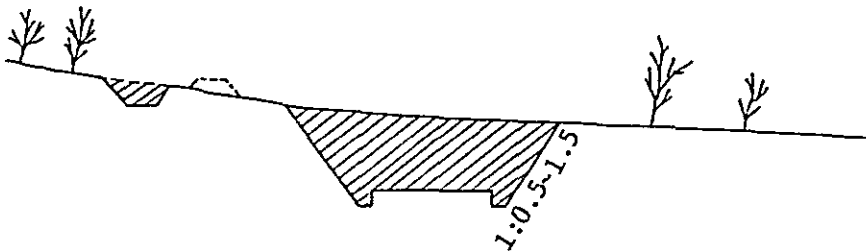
Conceptual Drawing of Cutting Work
